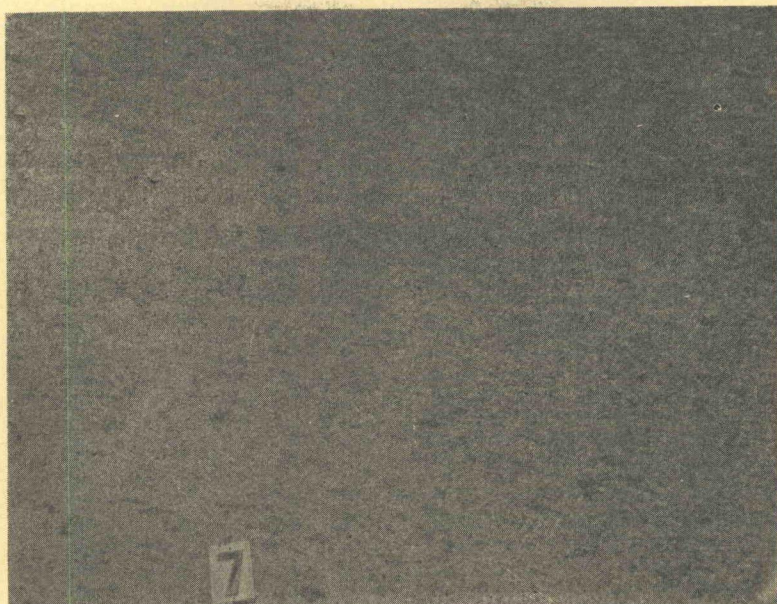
Typical Pavement Surface Texture on Portland Cement, Concrete Test Section (C8 Run)
